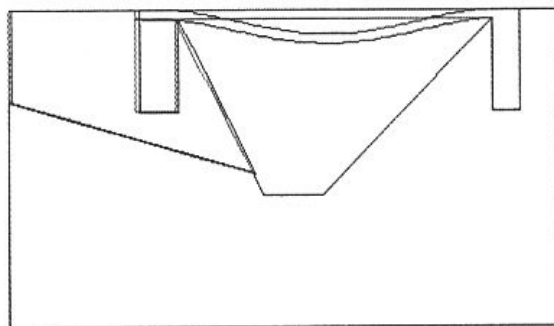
The deformed bridge on the nonstable slope, the pier situated in the moving foundation bed soil/rock.
